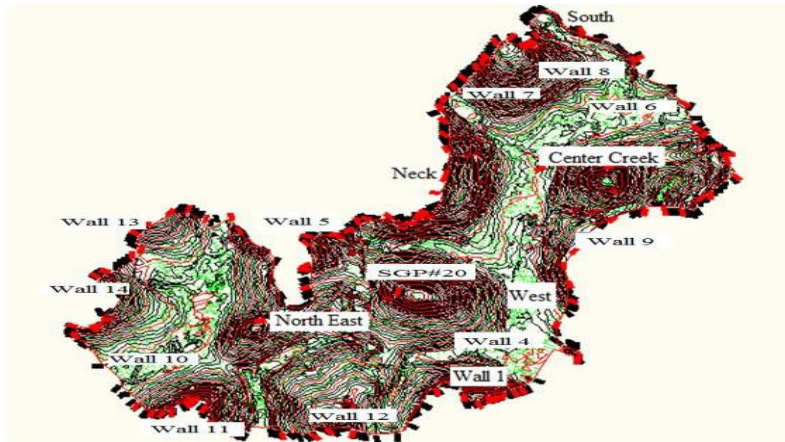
Site layout of the TSF dam, Tarkwa (Adu-Parkoh, 2016)
